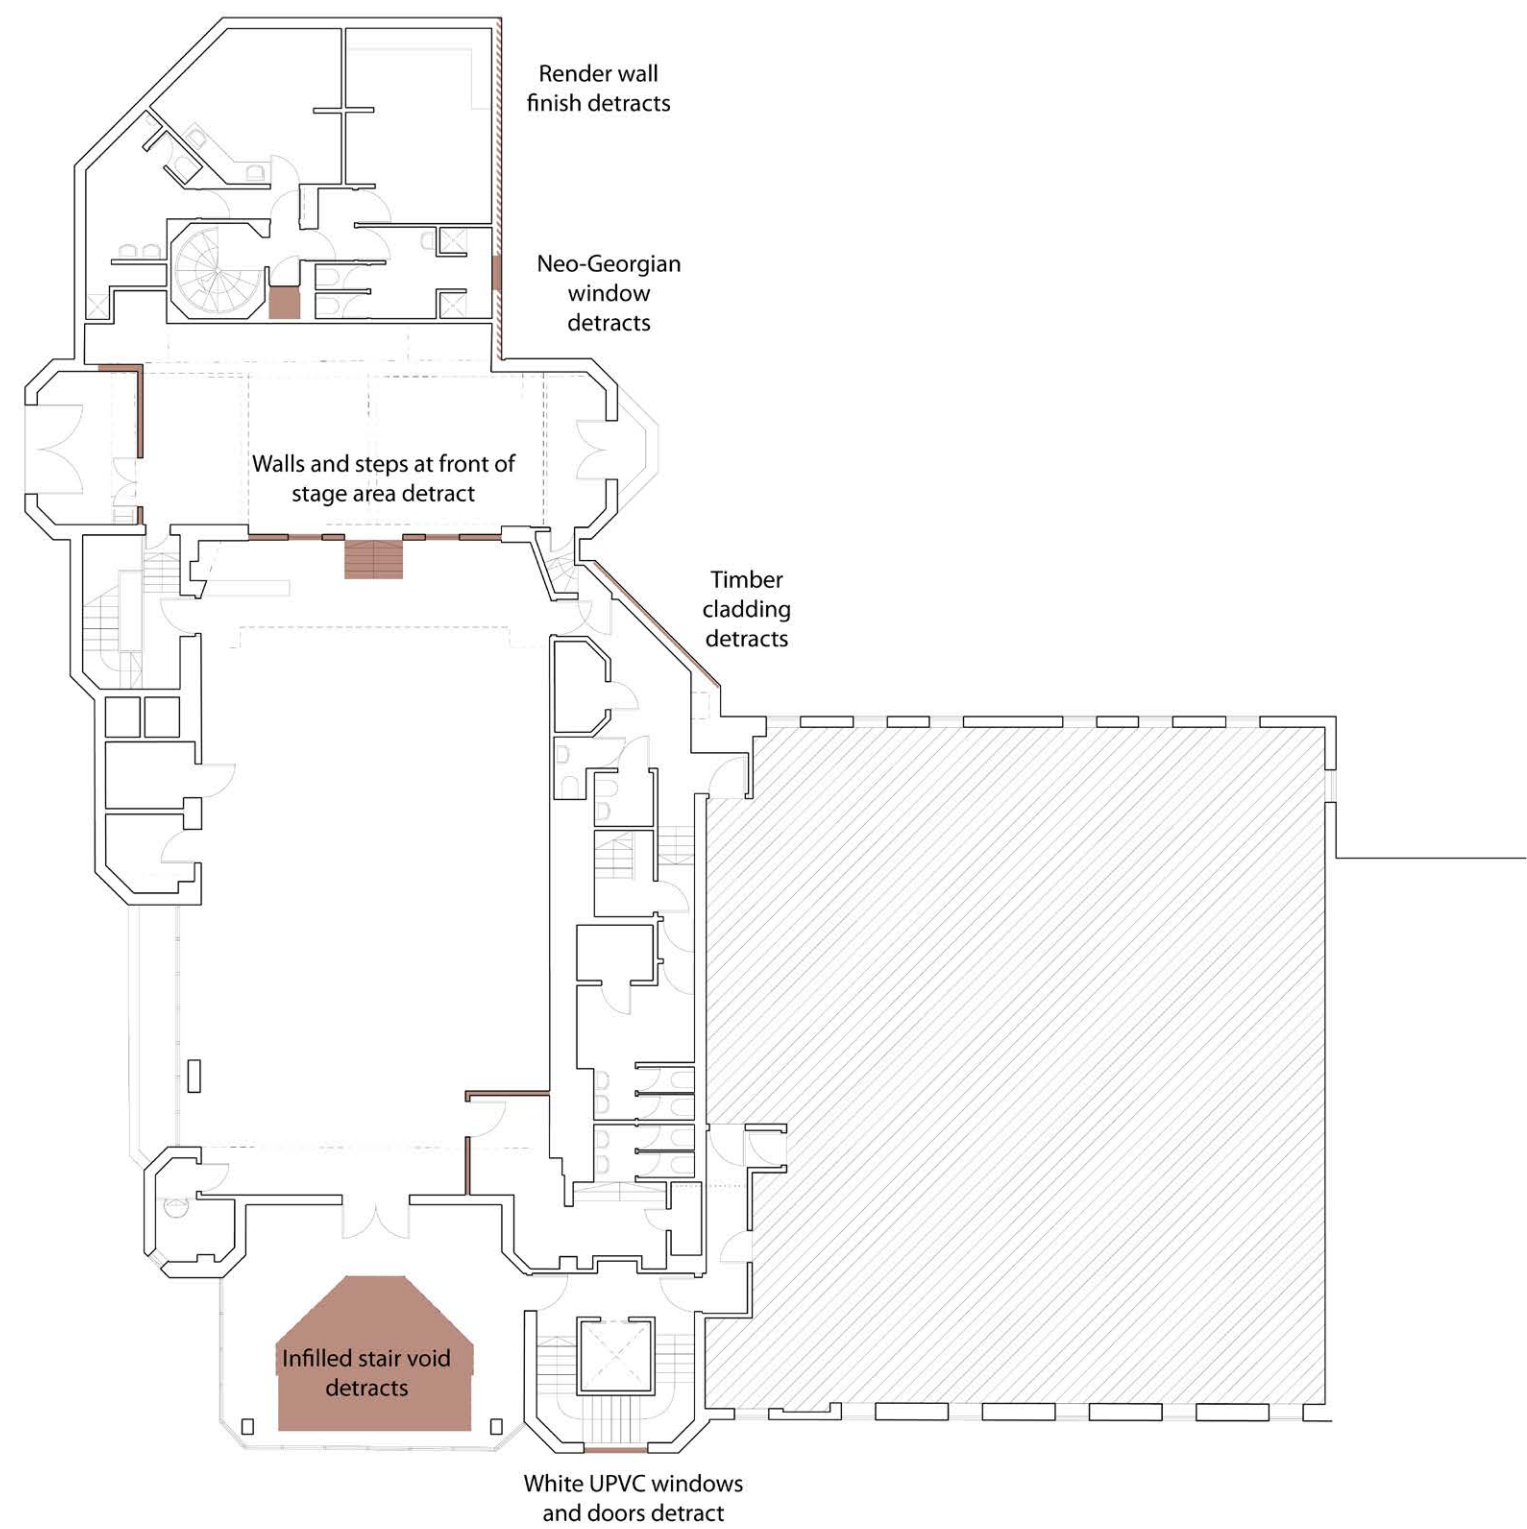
First floor detracting fabric [Ian Chalk Architects]
